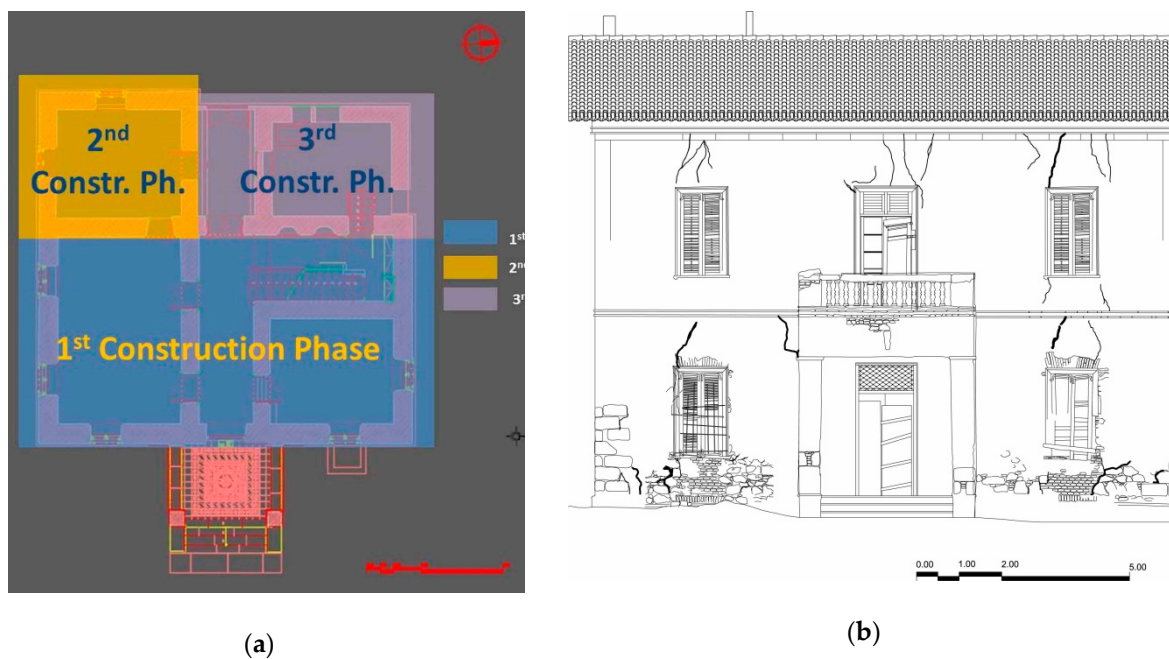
(a) Plan of the construction phases of the historic building; (b) east façade of Villa Klonaridi indicating the pathology of the walls.
